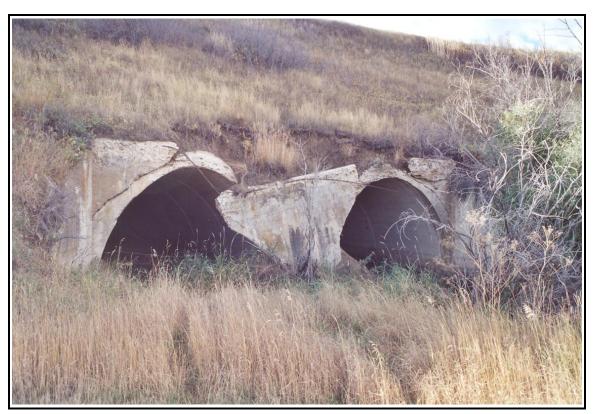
Concrete culvert ruin at the North Montana Line's Box Elder Creek crossing. View to the south/southwest.
